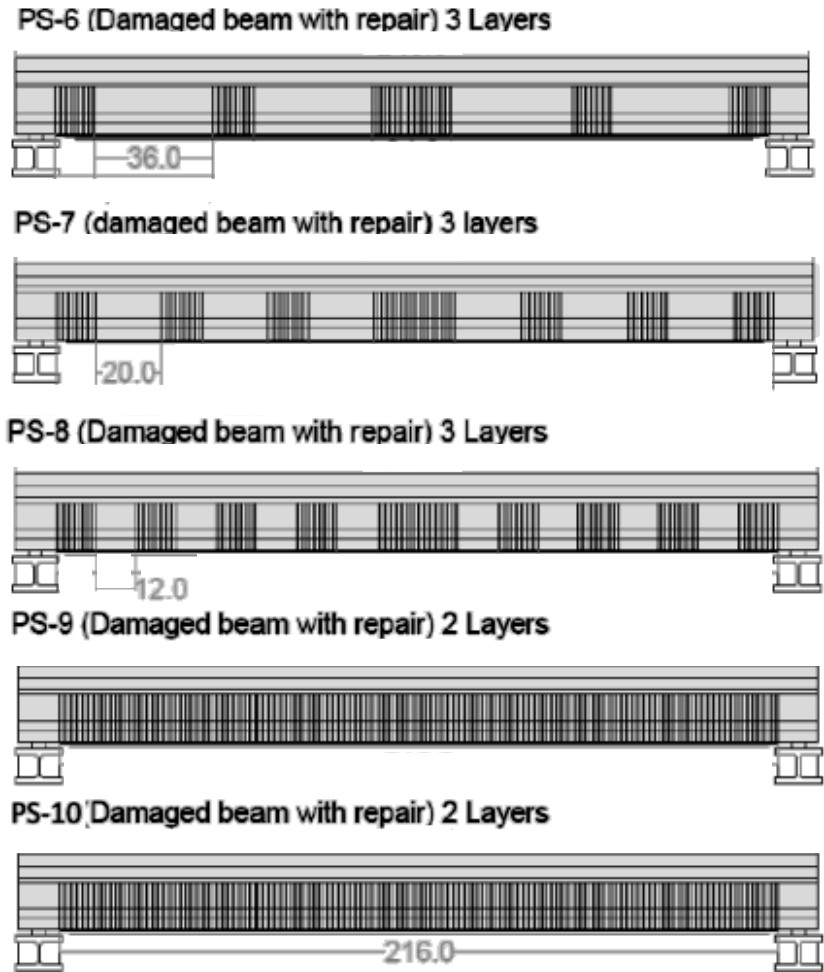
First 5 PSC Girders, CFRP Configuration Layouts
